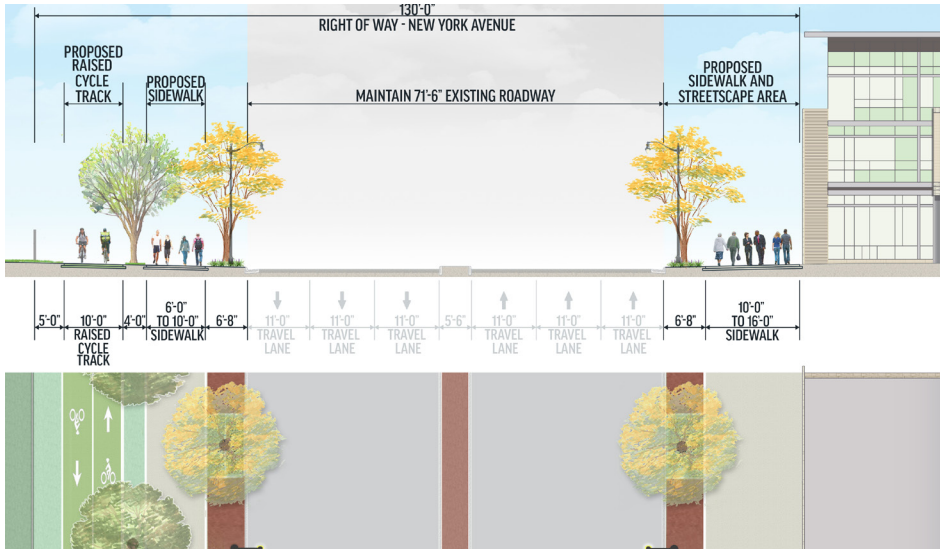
Typical streetscape section of New York Avenue NE between 4th Street NE and 16th Street NE excluding the intersection at 9th Street NE Bridge.
